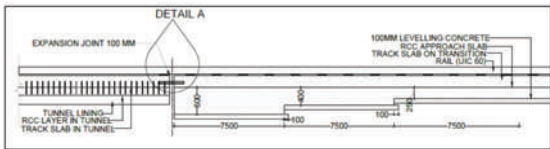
Transition detail from BLT in Tunnel to BLT in embankment.
